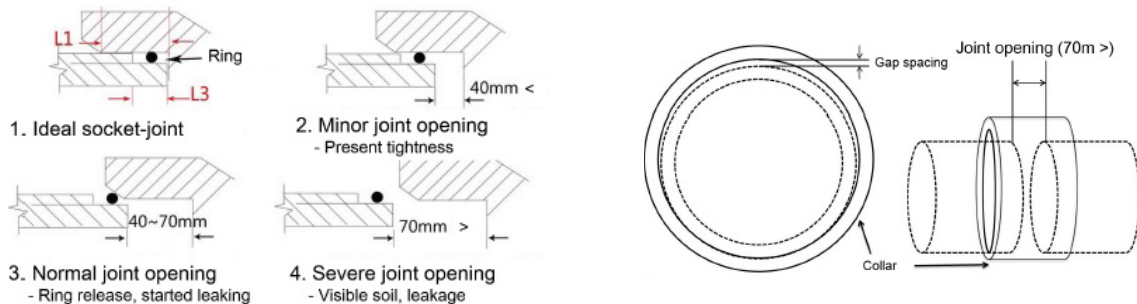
Dimension of Socket-Joint and Collar-joint (KS F 4403)
